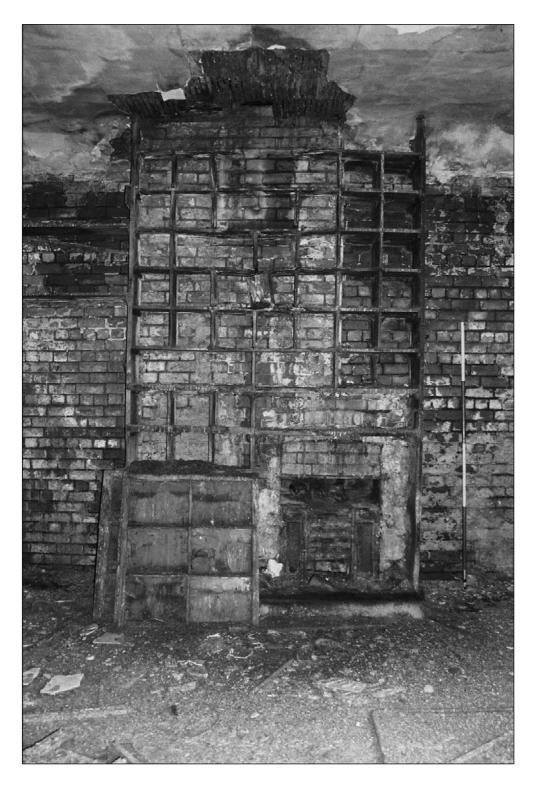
Detail of fireplace and timber shelving (film 41.33)
